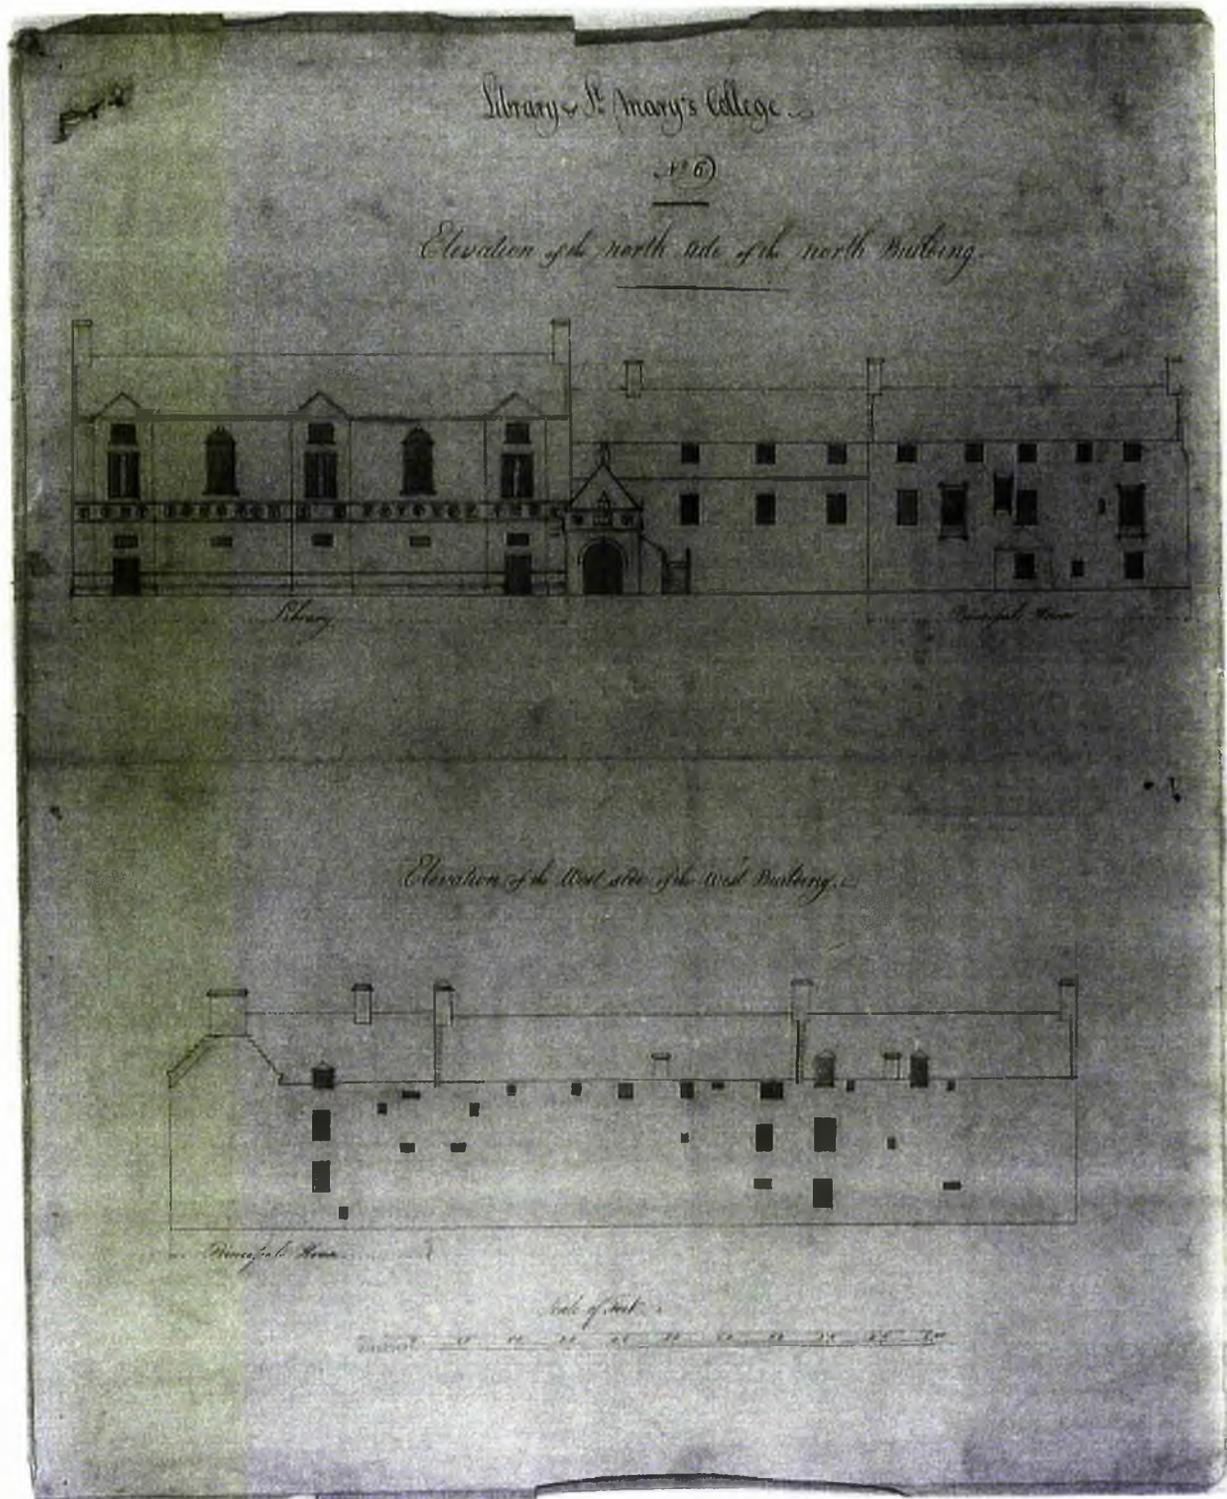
St.Mary's College. Survey drawing No.6 north elevation of north building and west elevation of west building. R. Reid, probably drawn 1825.
